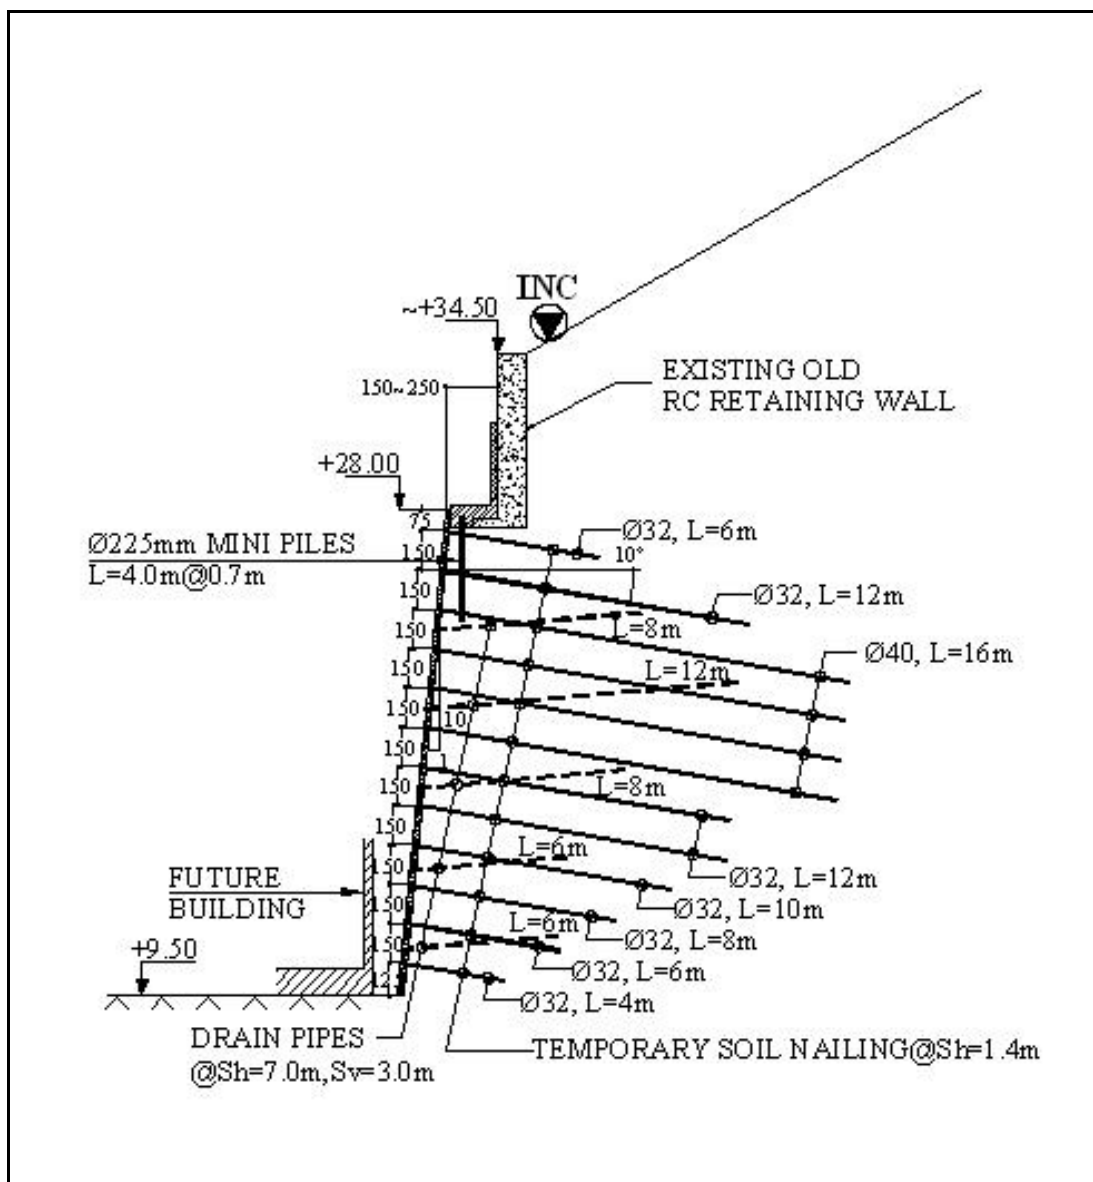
Detailed cross-section from temporary soil nailing under the existing old retaining wall
